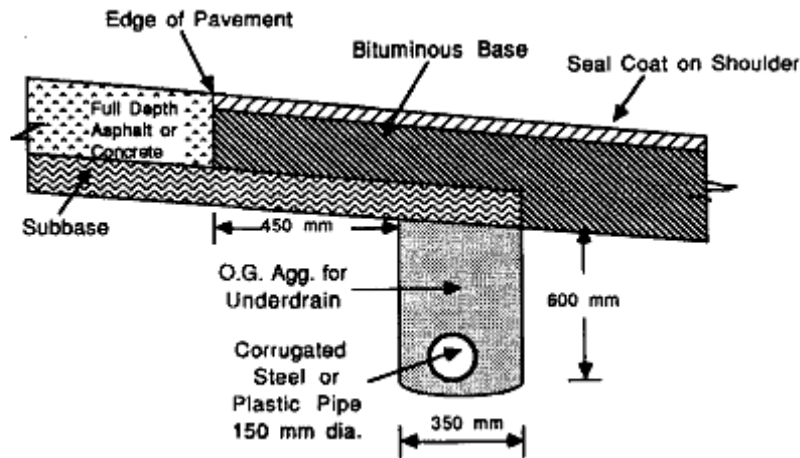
A typical cross-section of pavement with pipe edgedrain (ERES, 1999).
